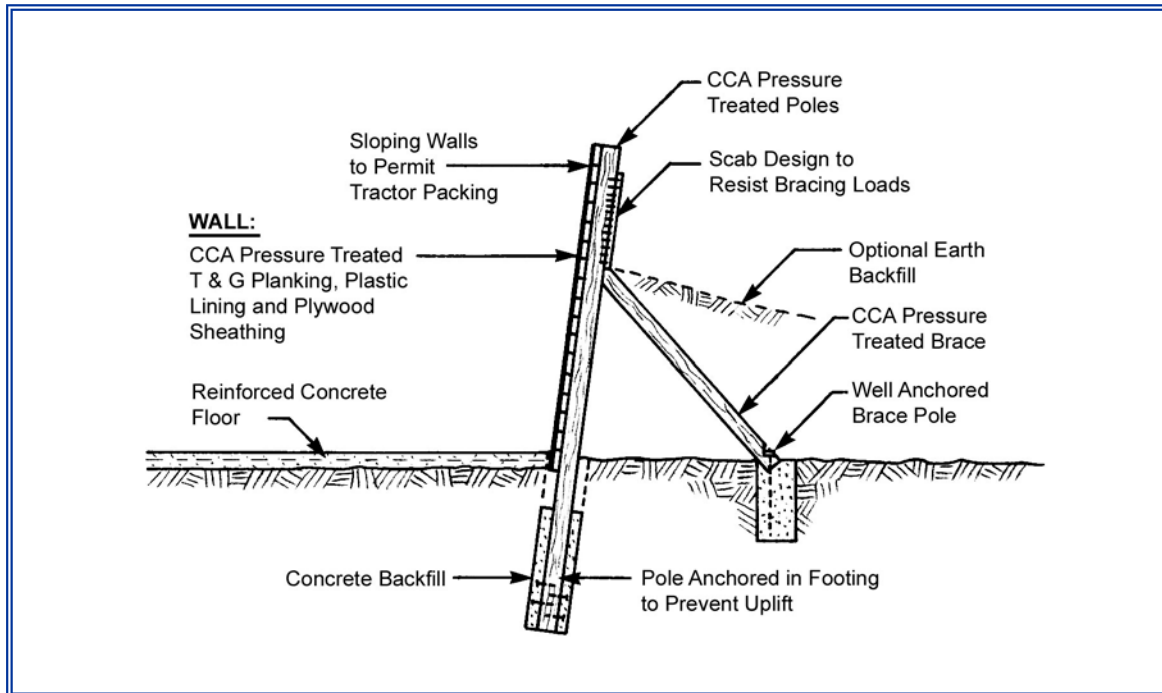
Typical Structural Requirements - Pole Type Horizontal Silo
